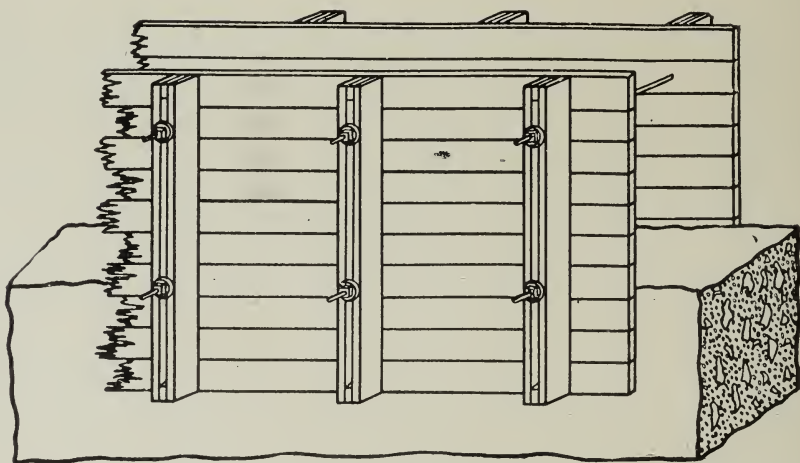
Forms for Concrete Wall. Pacific Coast Borax Refinery, Bayonne, N. J.
